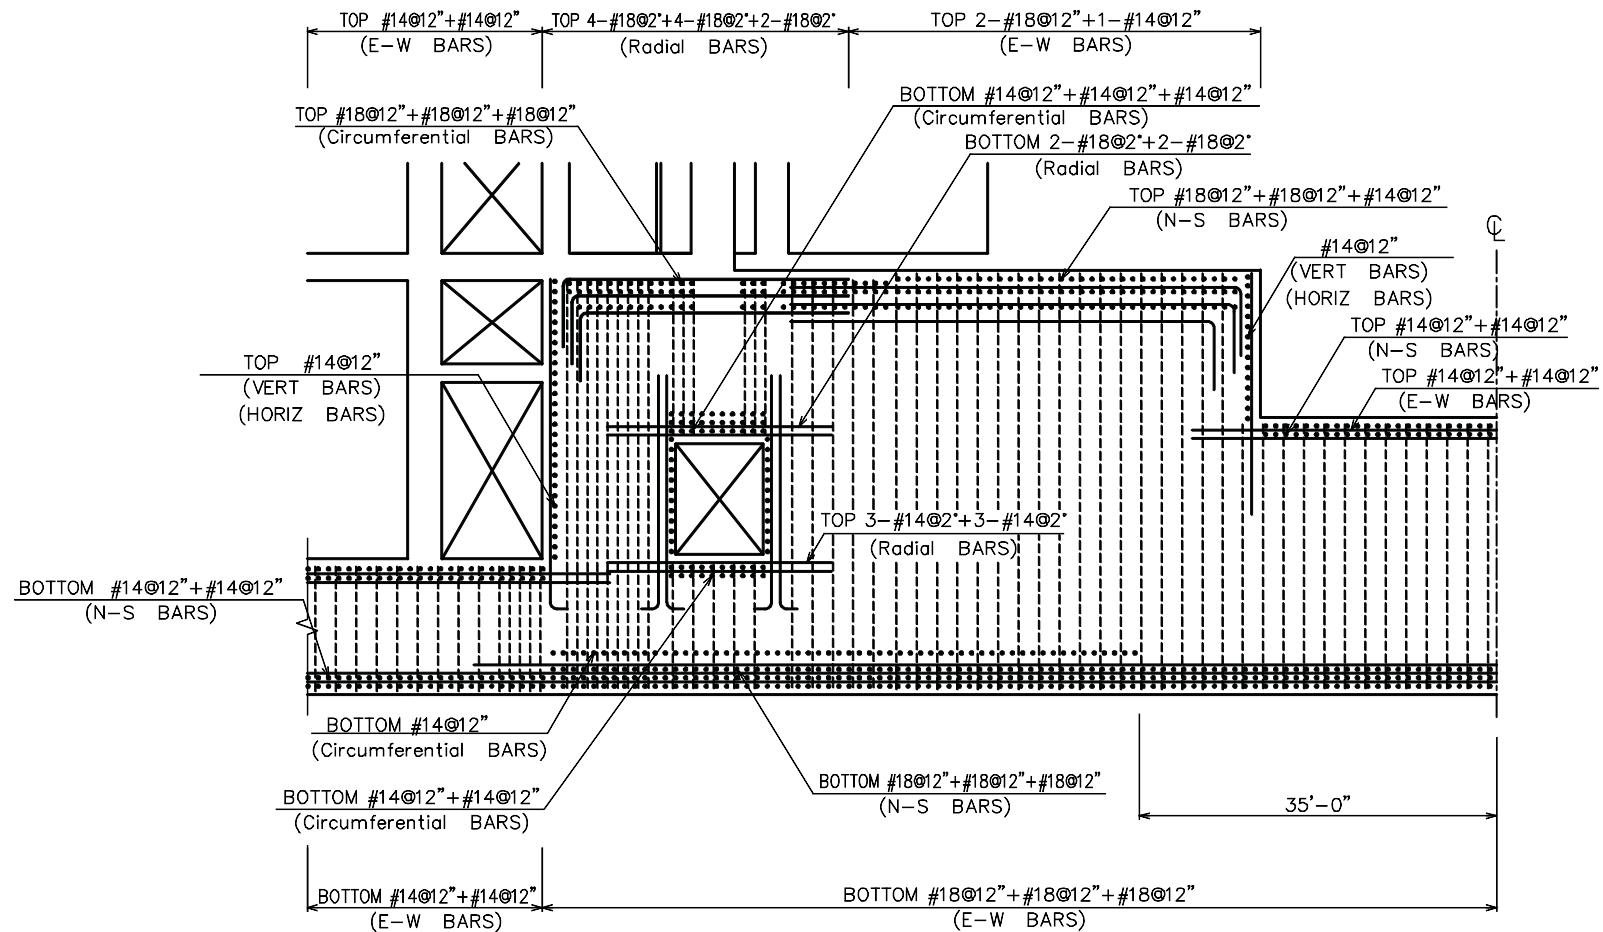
Reinforcing Steel of Basemat: SECTION E-W
